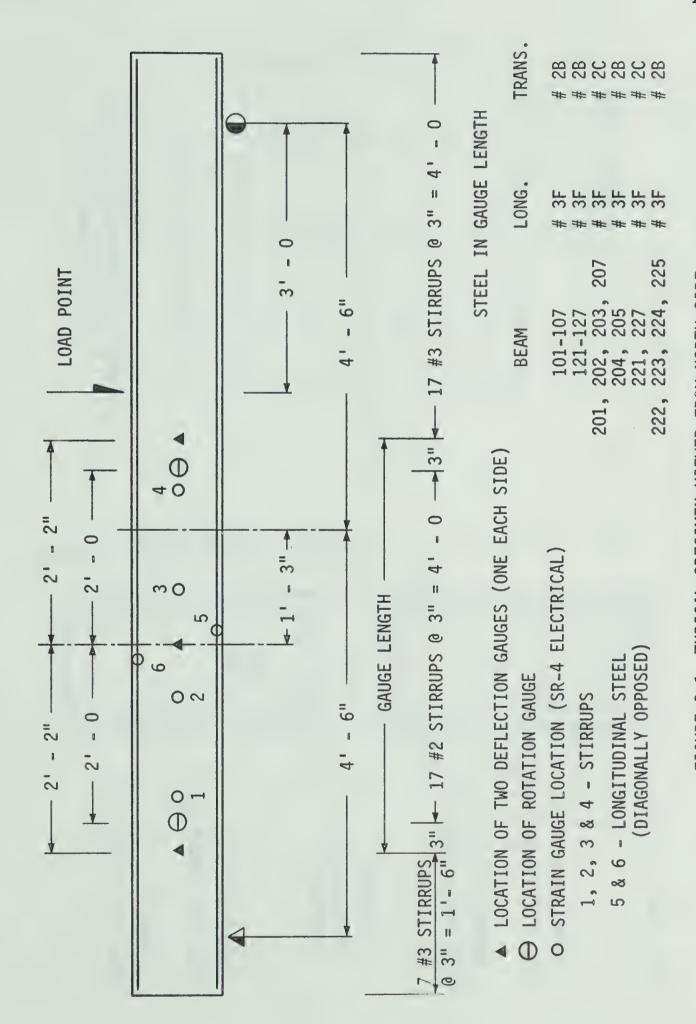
TYPICAL SPECIMEN VIEWED FROM NORTH SIDE
